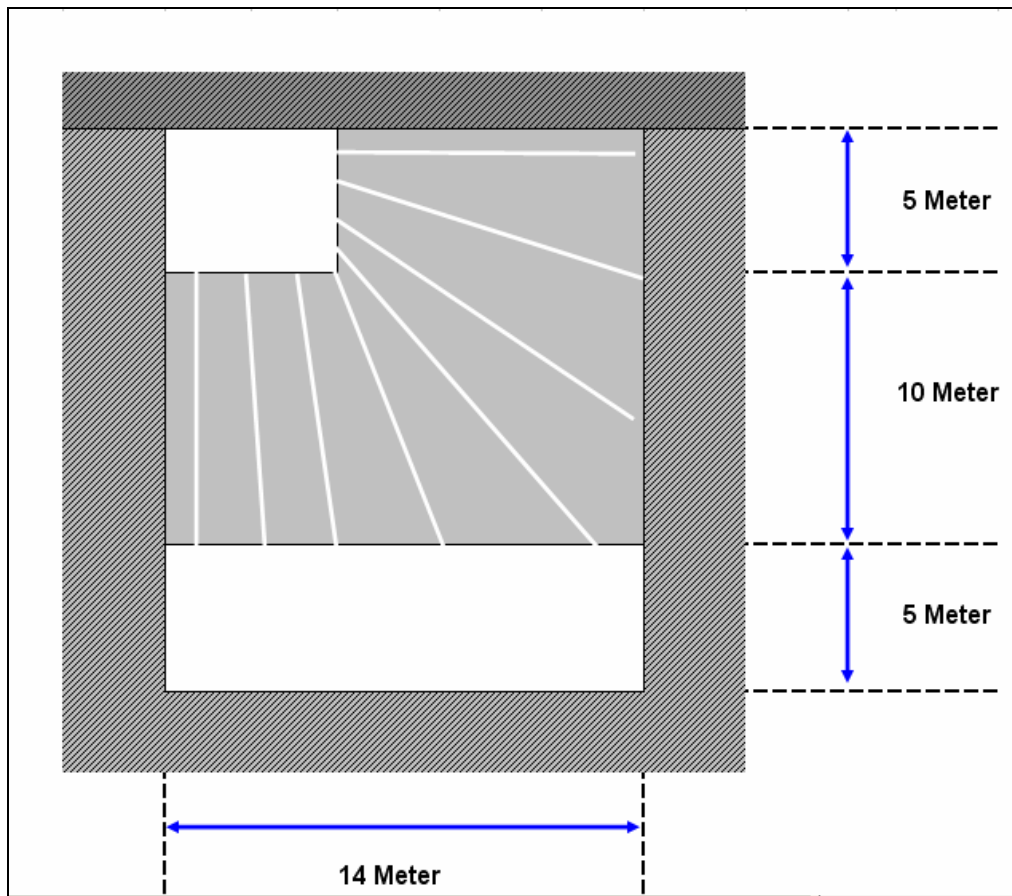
Schematic cross section through a long hole stope showing ring drilling pattern.
